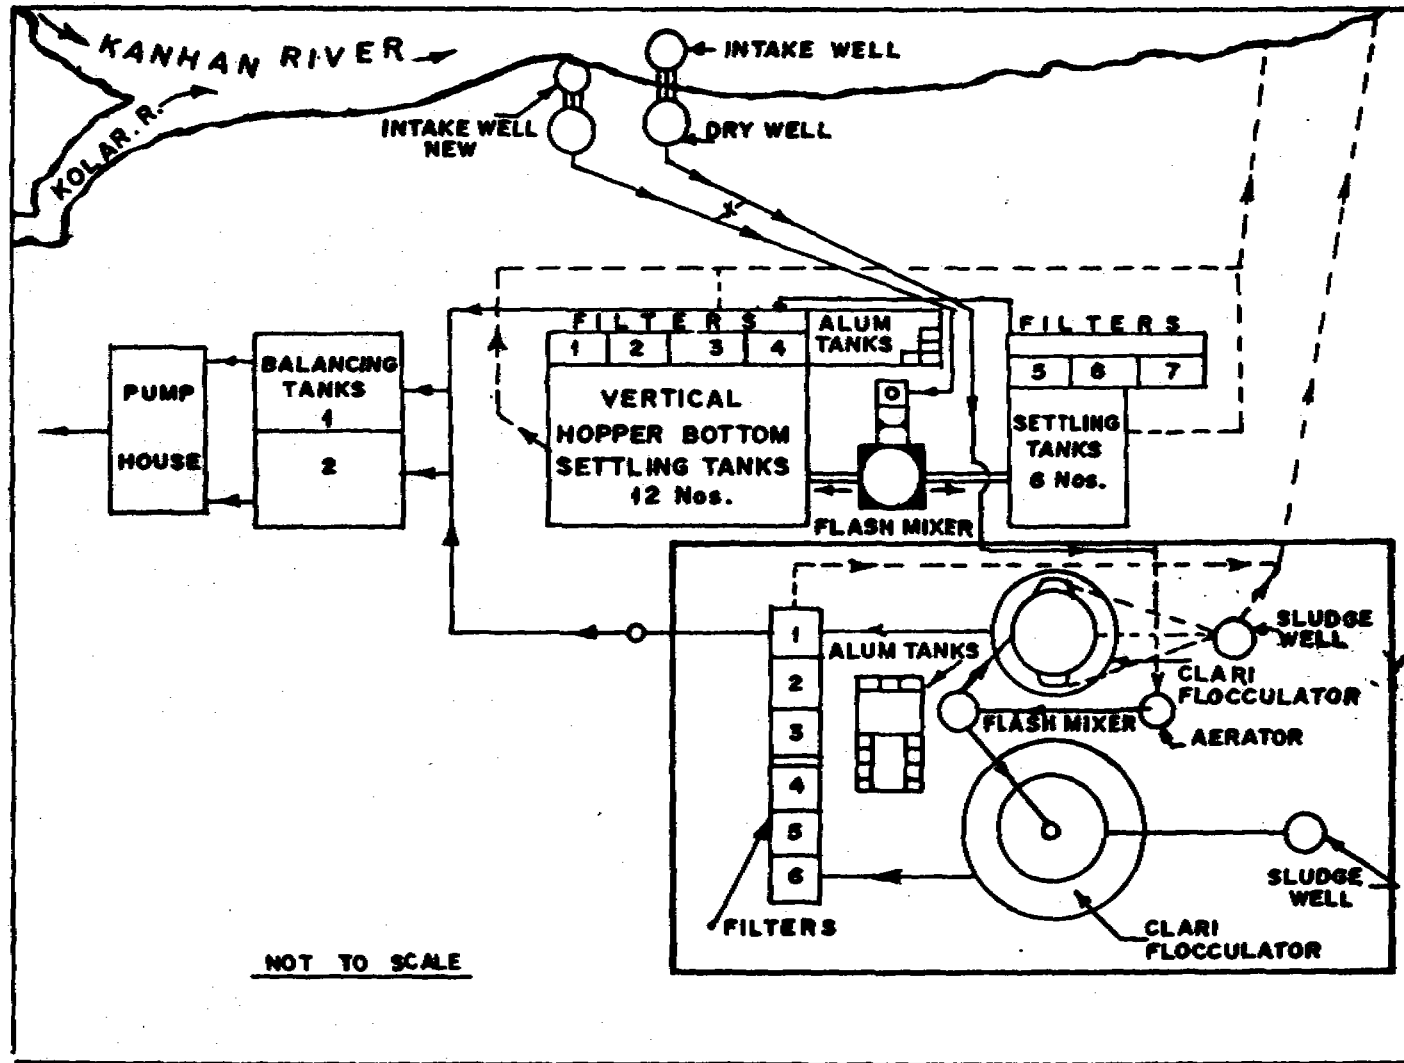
LAYOUT PLAN OF KANHAN WATER WORKS, NAGPUR
